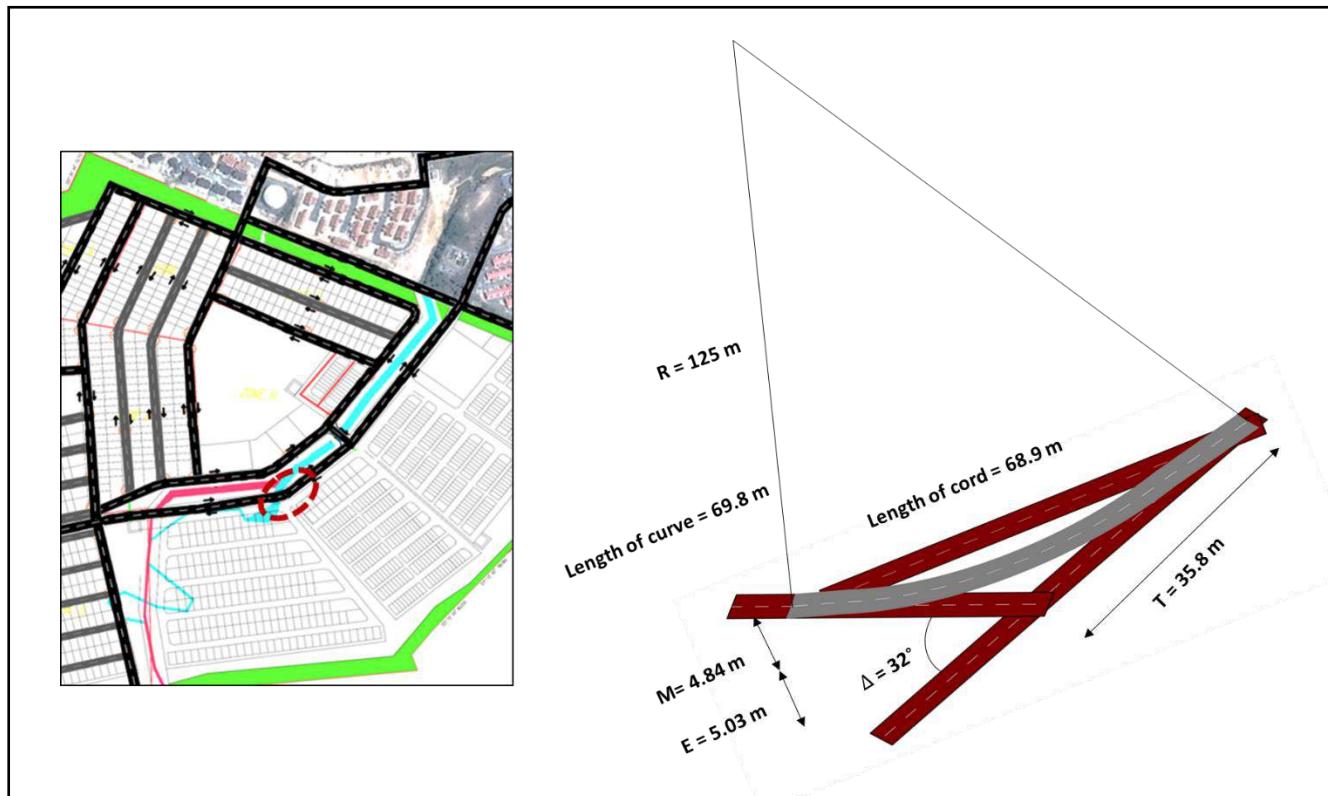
Proposed Horizontal Alignment at Jalan Gambang (South)
